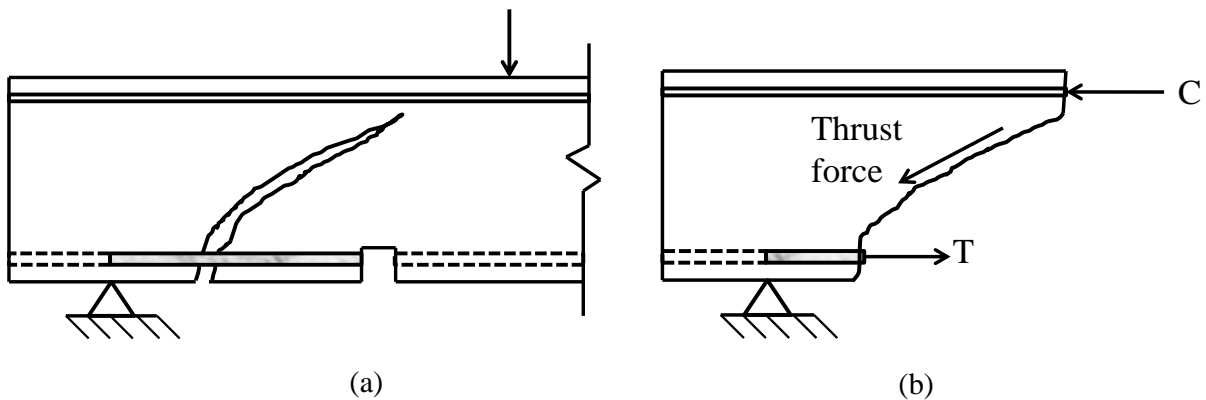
(a) Schematic drawing of beam with diagonal crack, (b) a section of the beam at the crack.
